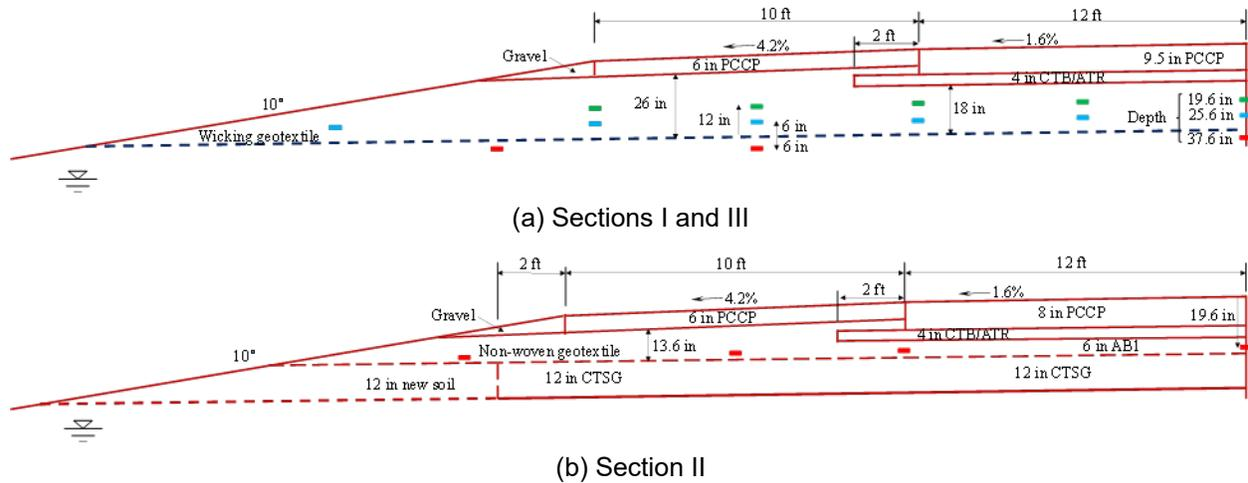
Cross Sections and Sensors in the Pavement Sections
